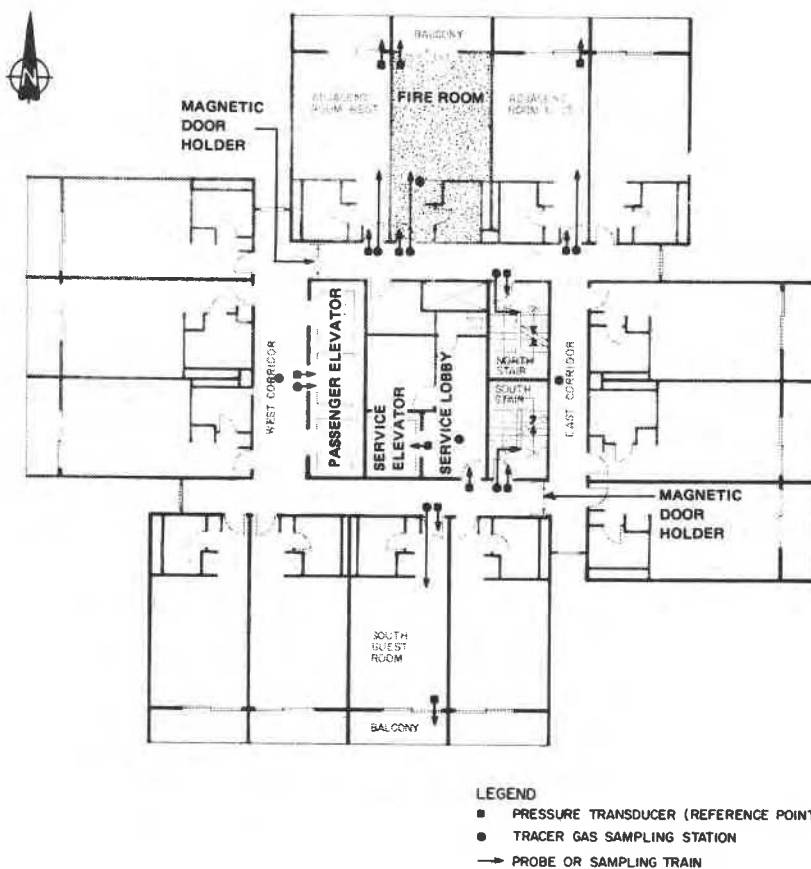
Second and typical floor plan - pressure difference and tracer gas sampling locations
